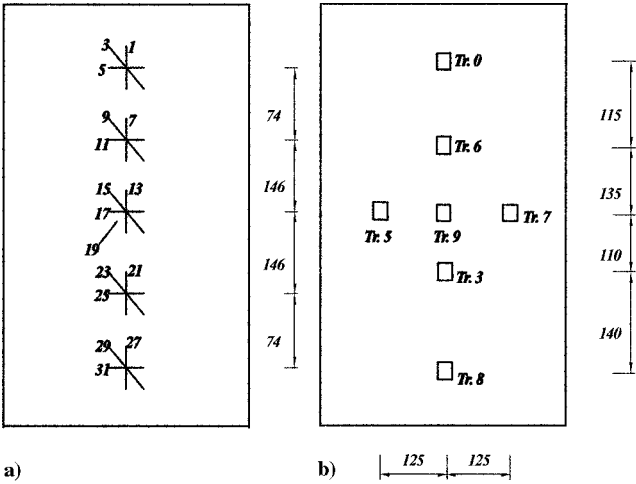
a) Strain gauges location and b) Inductive transducers positioning. All dimensions are in millimeters.
